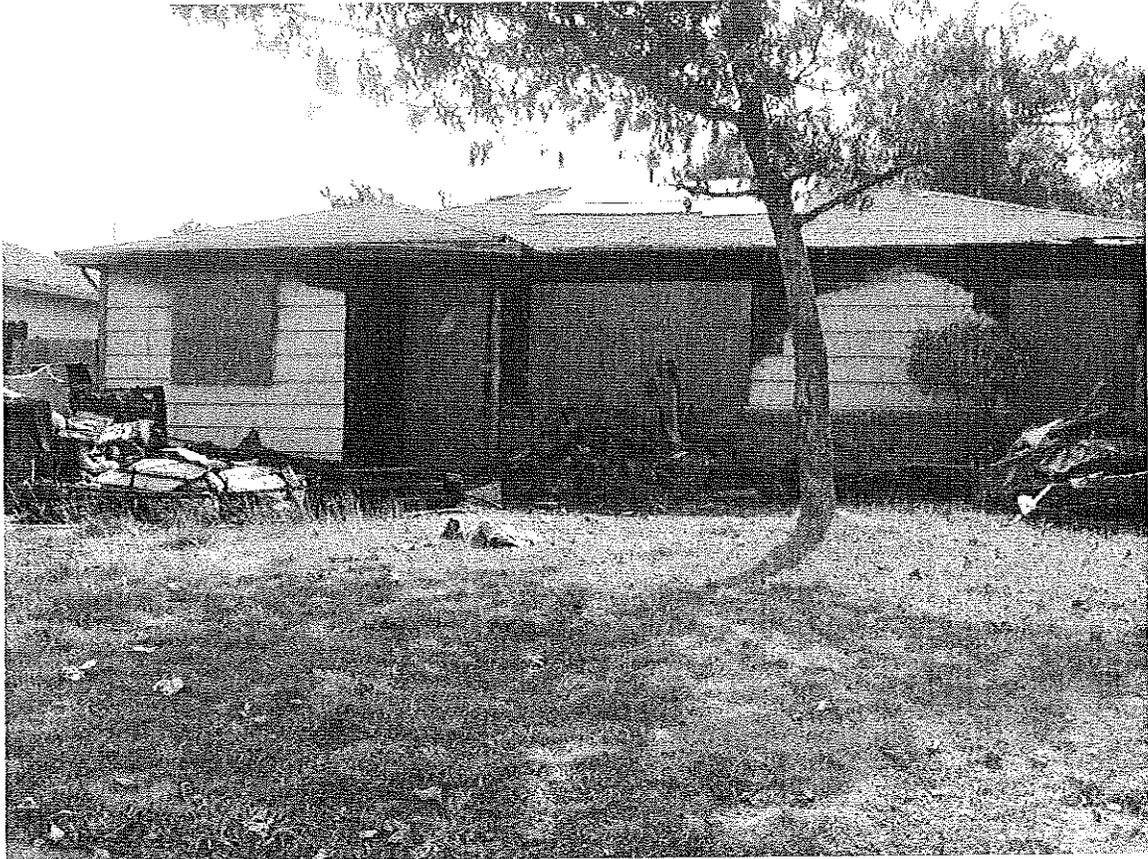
3900 Block of Huron Street, APN 251 0041 023: This single family residence has sustained major fire damage and is currently uninhabited. The roof, eaves, overhangs, and exterior are badly damaged, and debris covers the front yard.
